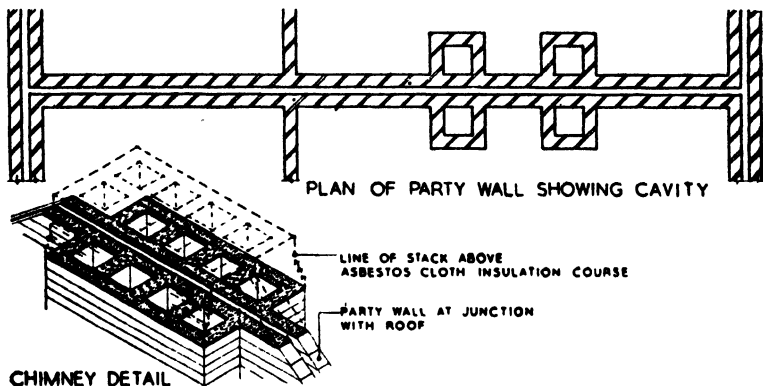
A. DISCONTINUOUS CONSTRUCTION FOR CAVITY-WALLED DWELLING HOUSES
